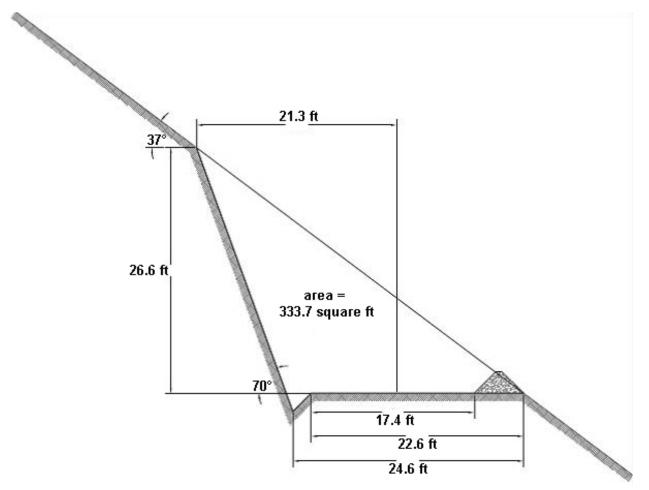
Typical Cross-section Showing Full Bench Cut on Cut Slope 70°
